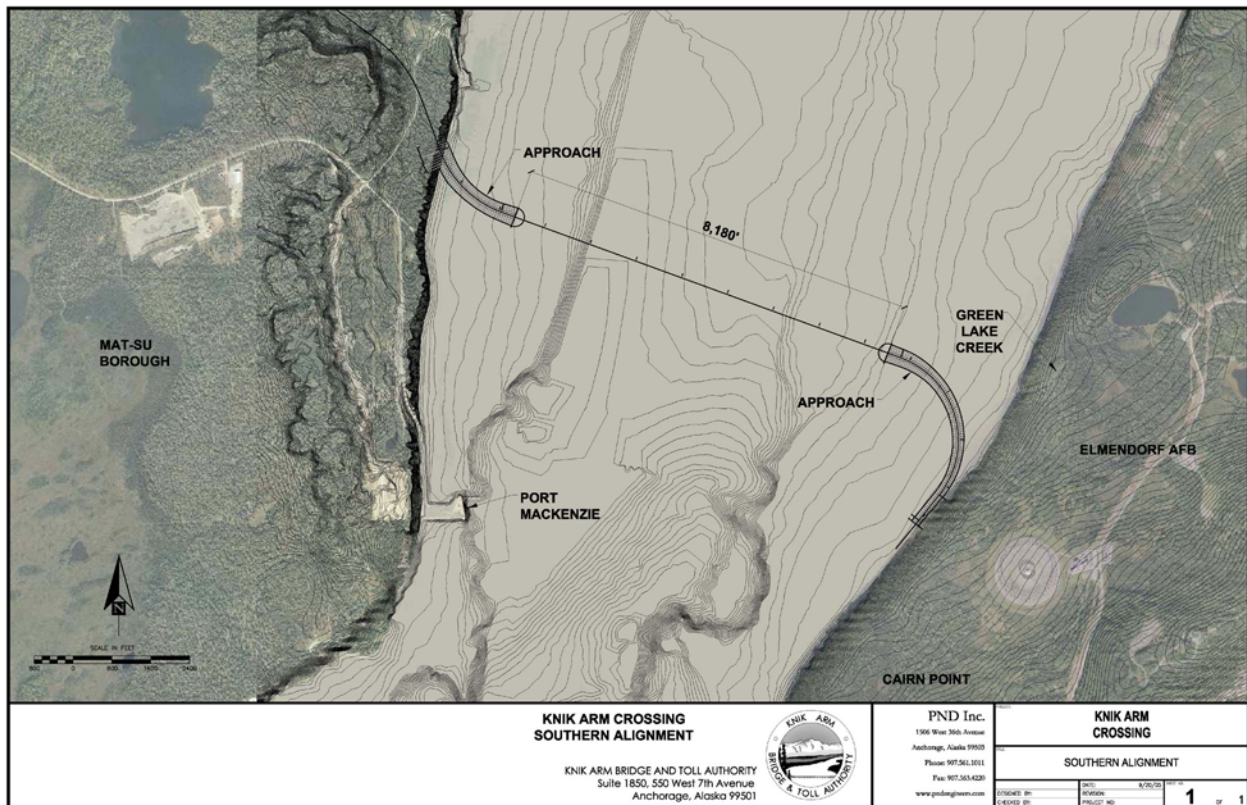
September 2005 Proposed Alignment of Knik Arm Bridge
